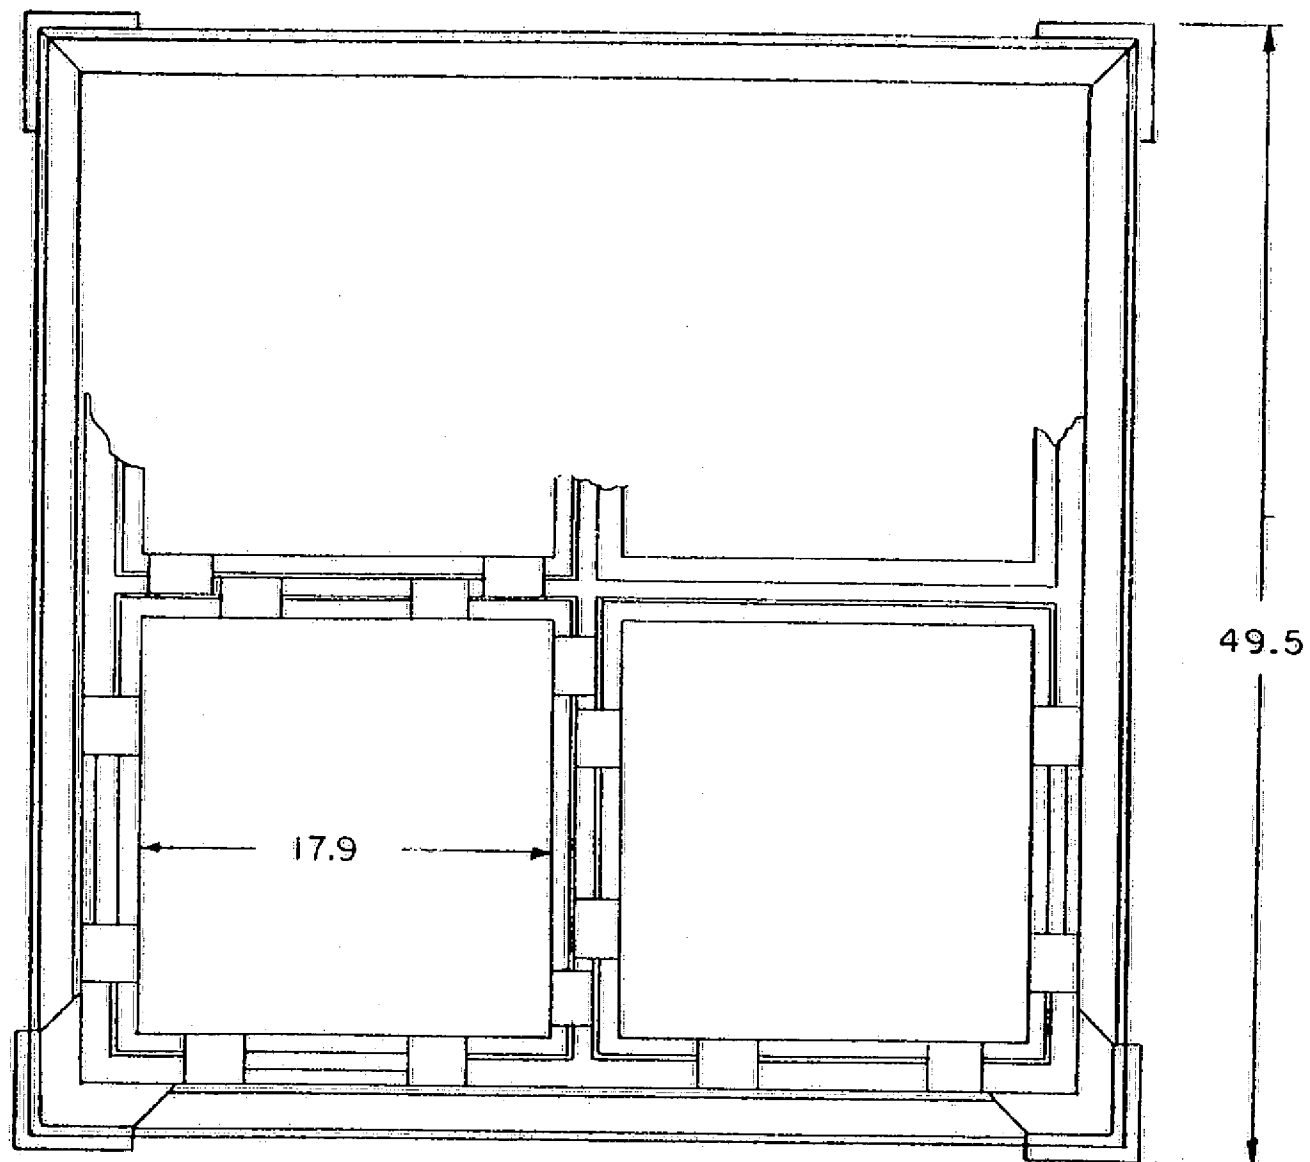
Typical Section - 1/4 Meter Structure
